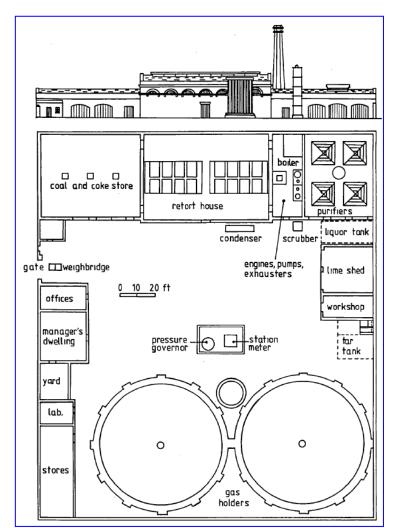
Typical medium-sized gasworks layout from the 1870s (after Newbigging 1879)
